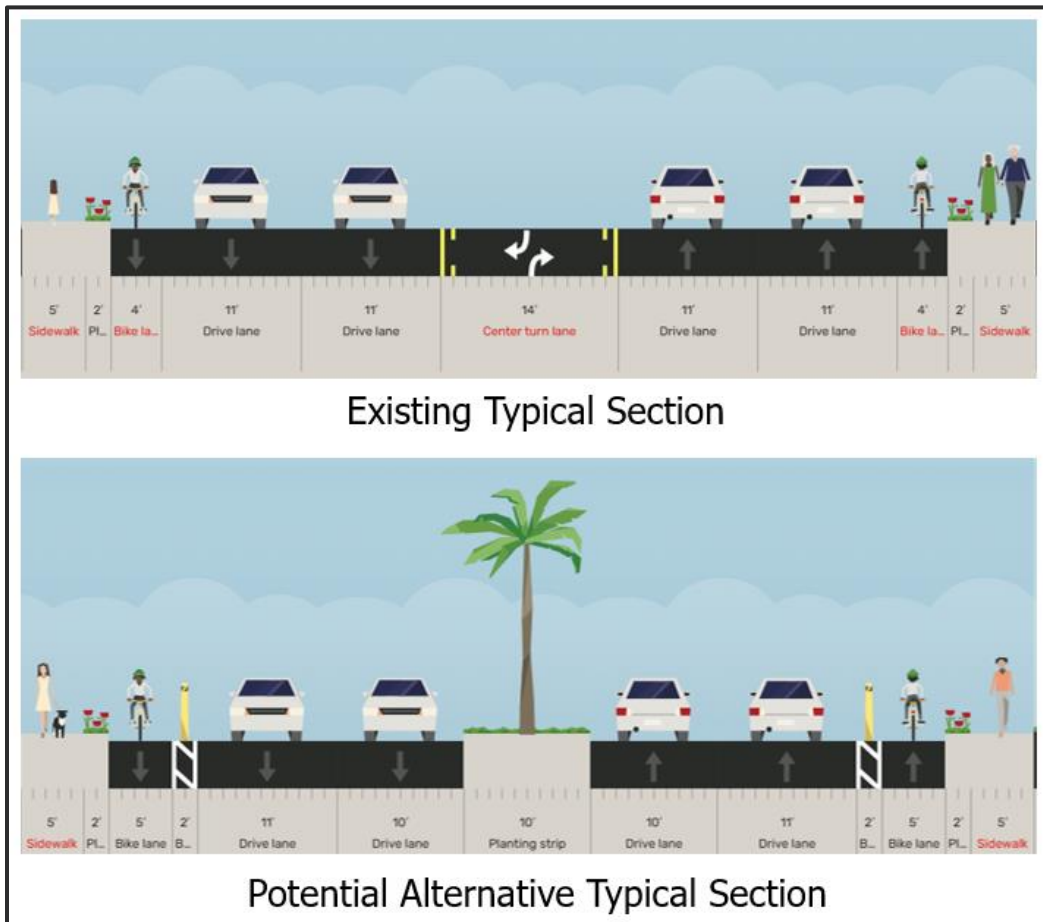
President Barack Obama Highway Existing and Potential Alternative Typical Section
